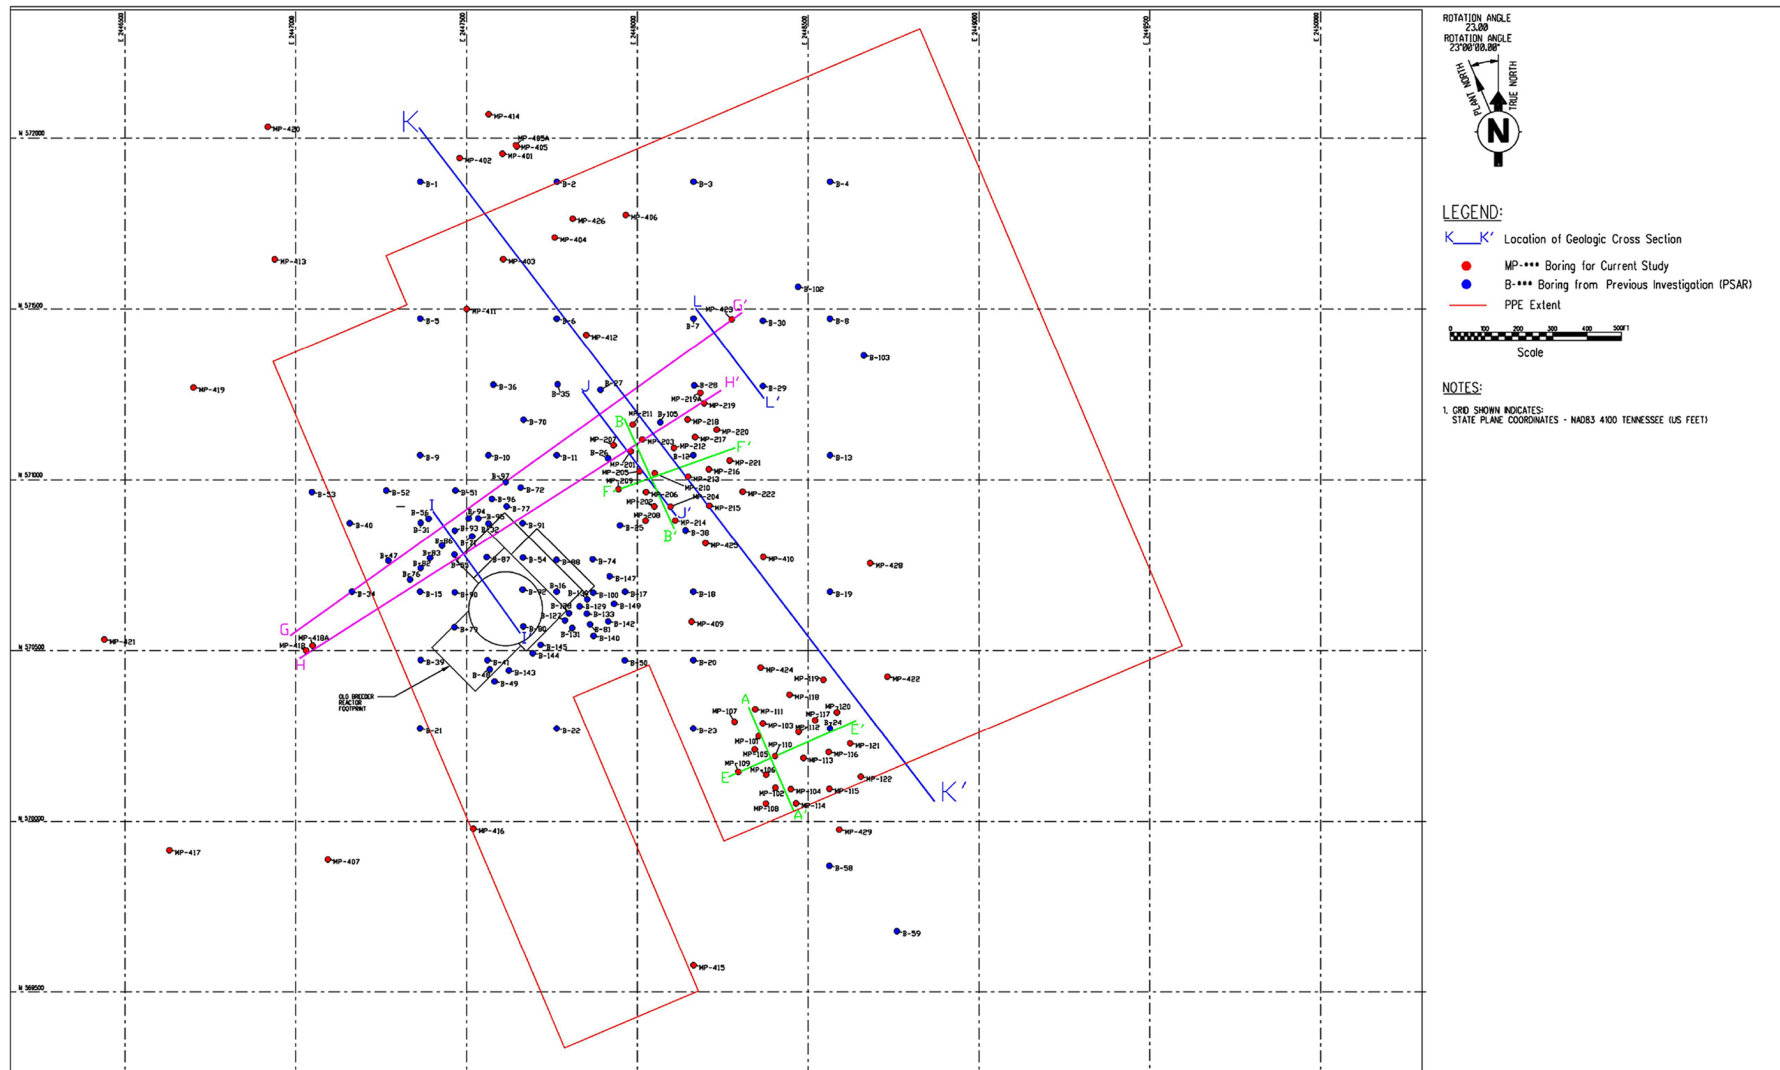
C-12. (Sheet 1 of 11) Geologic Cross-Section Location Plan
